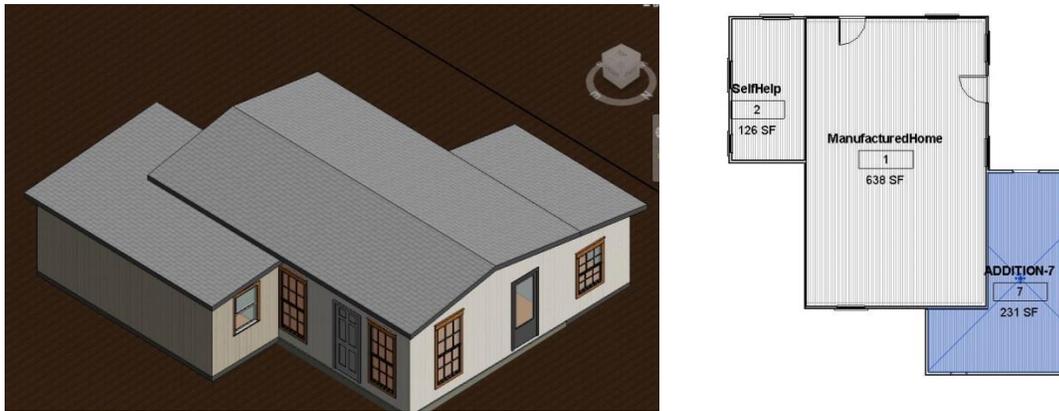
House 15 with East-C option addition: 3-dimensional image and plan
